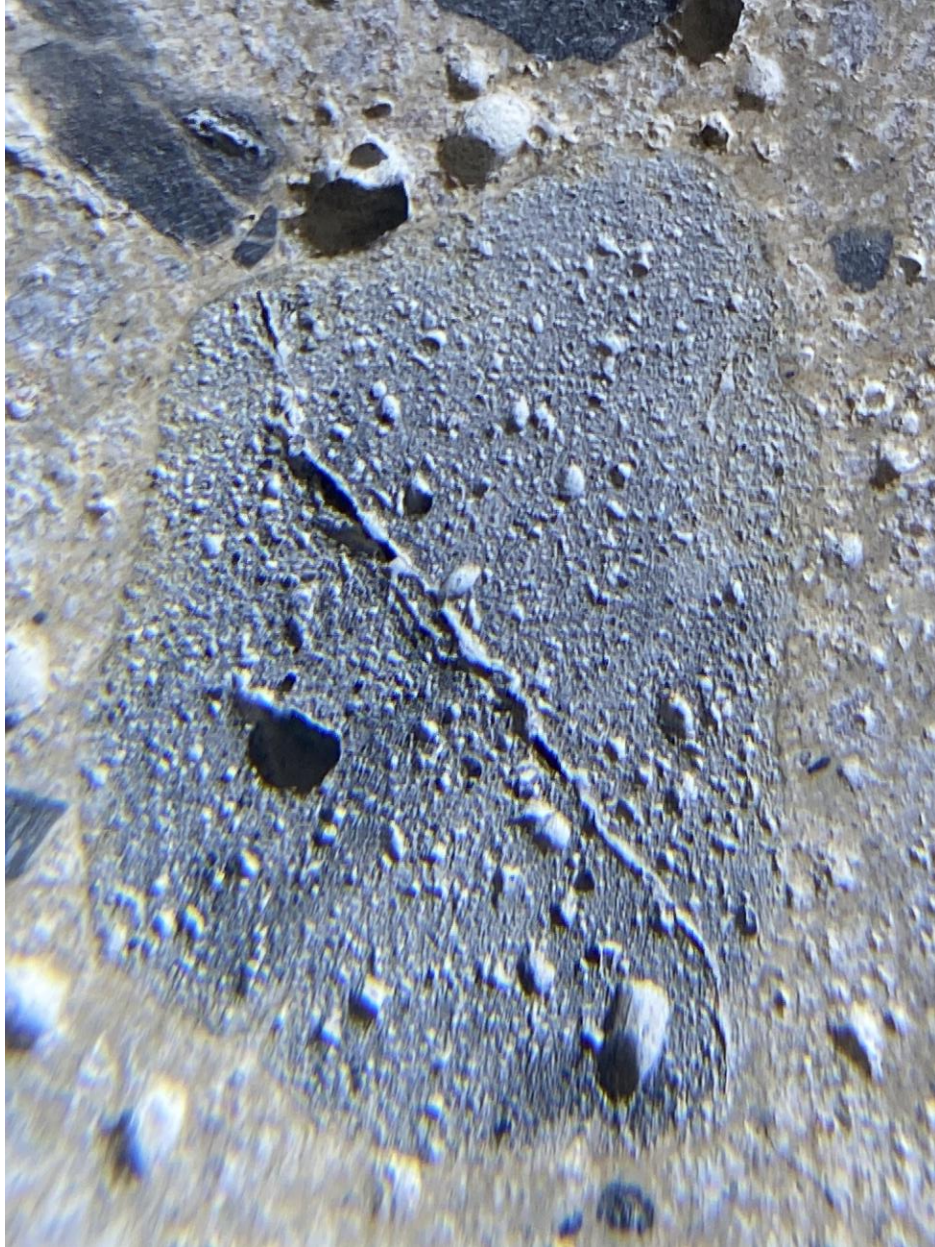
Aggregate in core 1 of lightweight concrete deck at bridge C-1011 (1).
